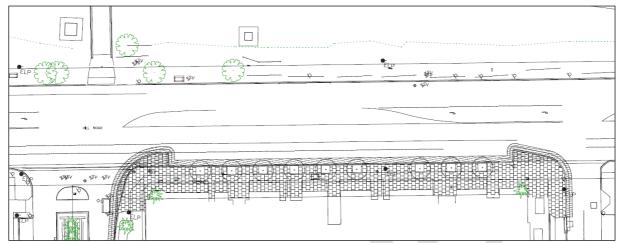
Draft concept of Council's works in Hill Road between Footbridge Boulevard and Park Street North
